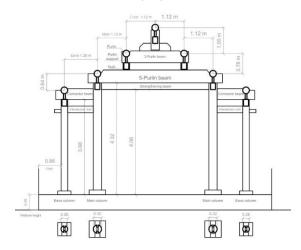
Section of the "seven purlins" stacked beam timber structure.
